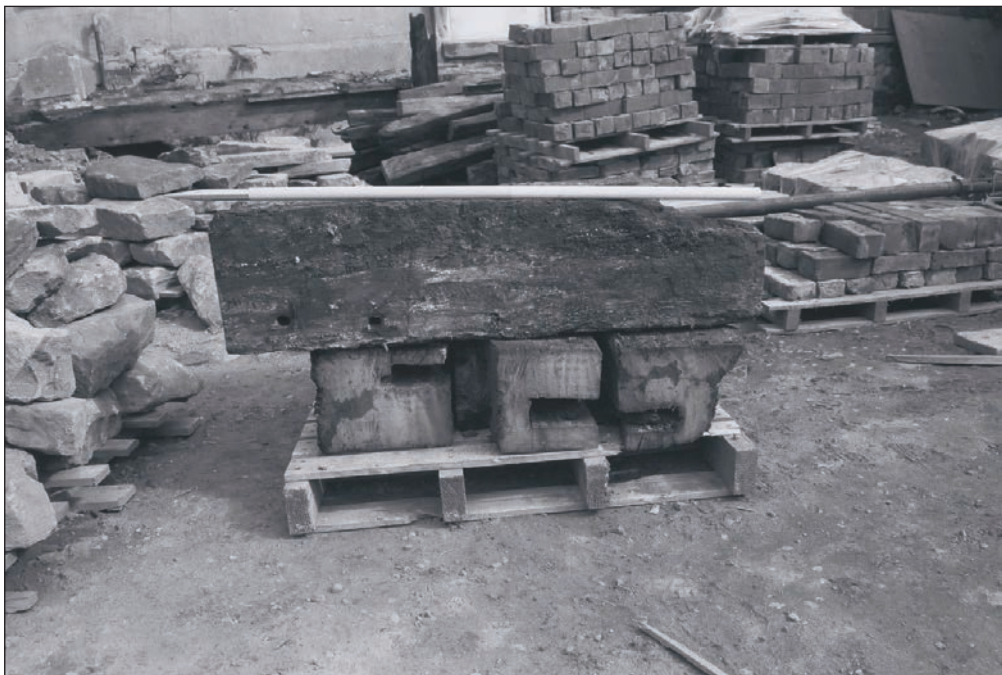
General view of removed and cut wall plate from Building 1, during the watching brief (Film 39.02)
